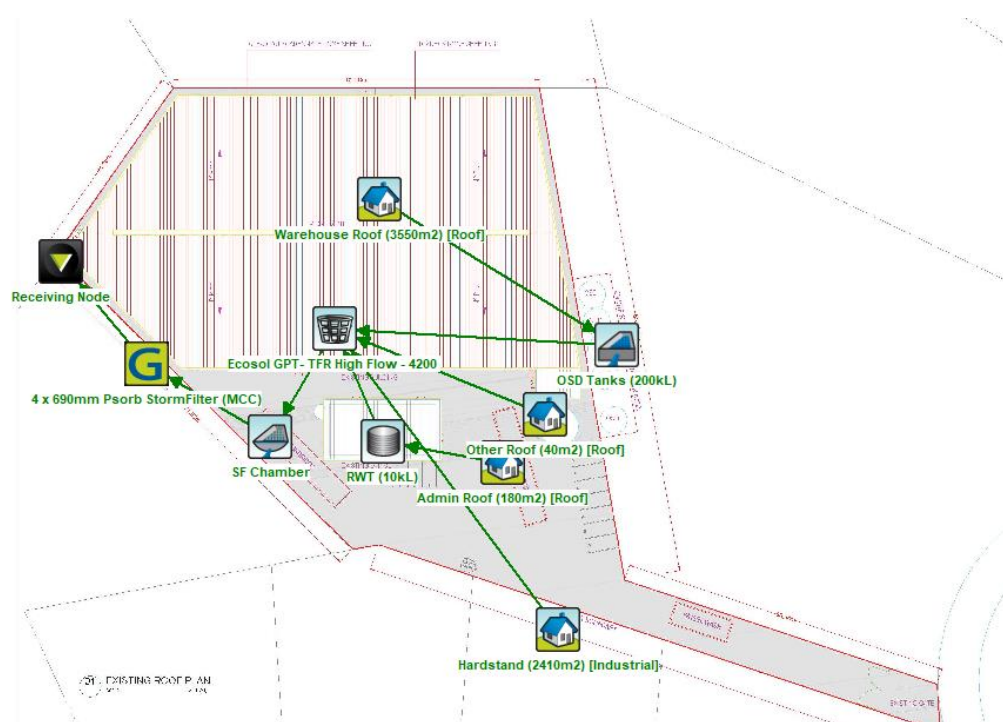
MUSIC Model Arrangement for Proposed Stormwater System Upgrade
